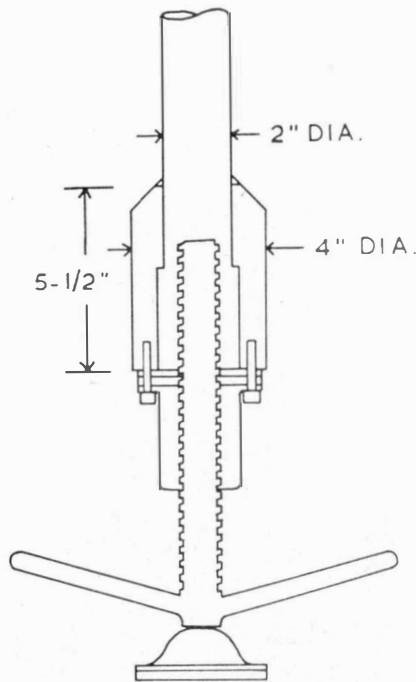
Adjustable leg which forms part of the bottom set of end panels in the tower.
